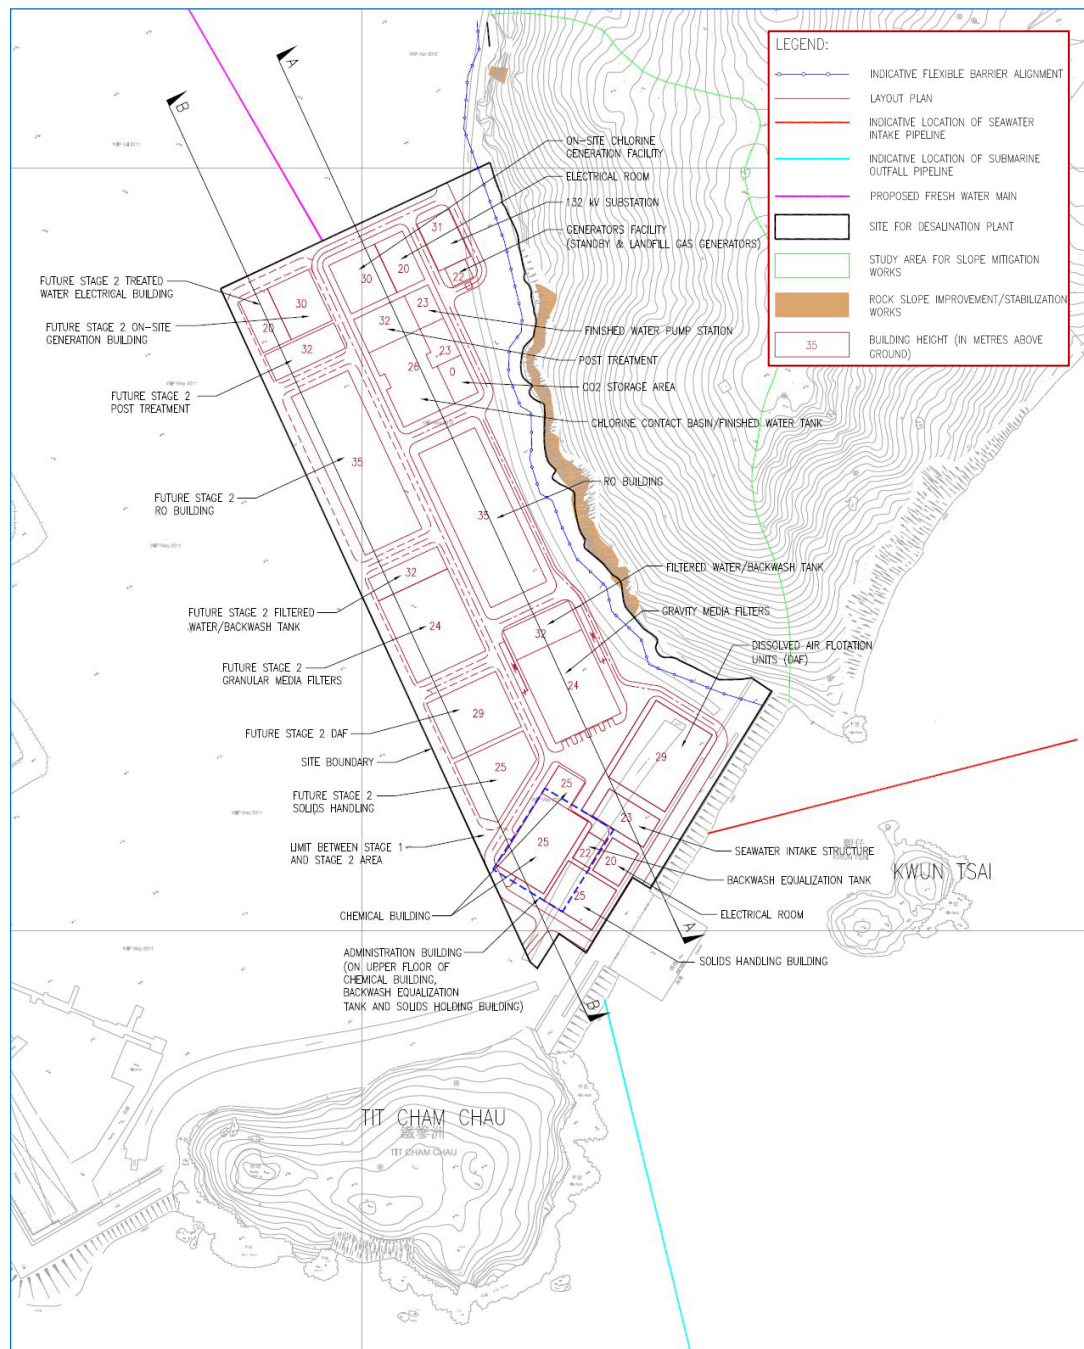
Layout Plan for the Proposed Desalination Plant
